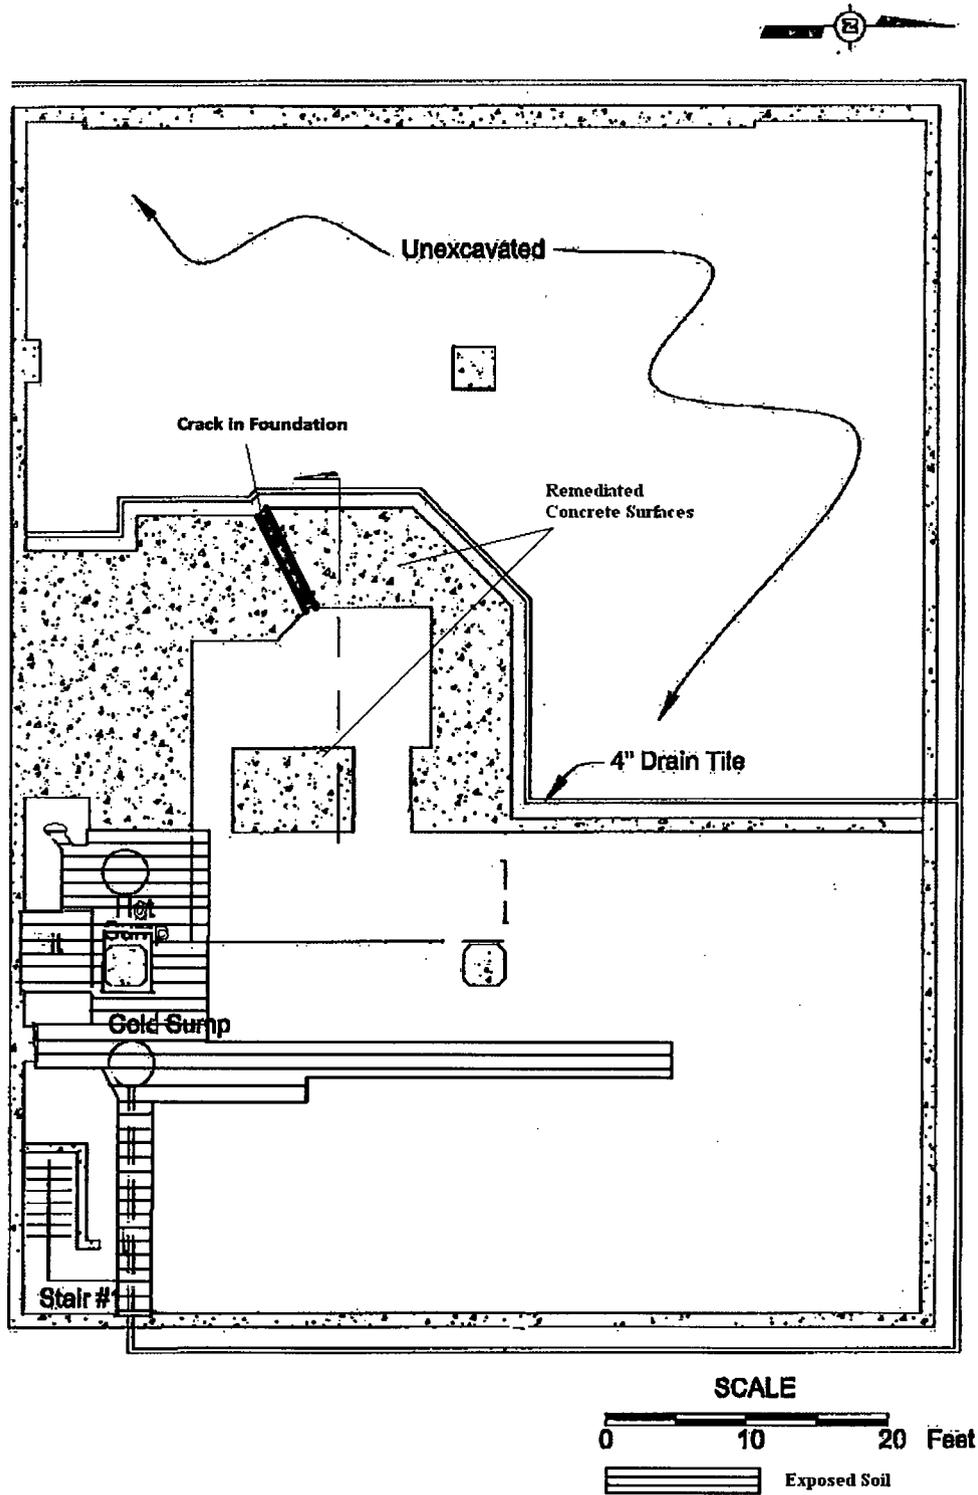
Floor Plan of the Ford Nuclear Reactor Building Basement
